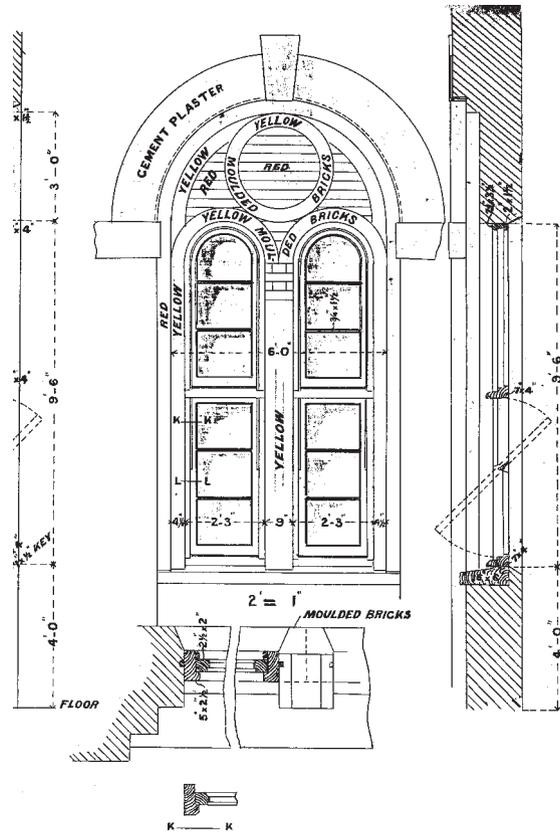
Detail from plan for the Carriage Shop 1884. TWRM / QR Archive.
